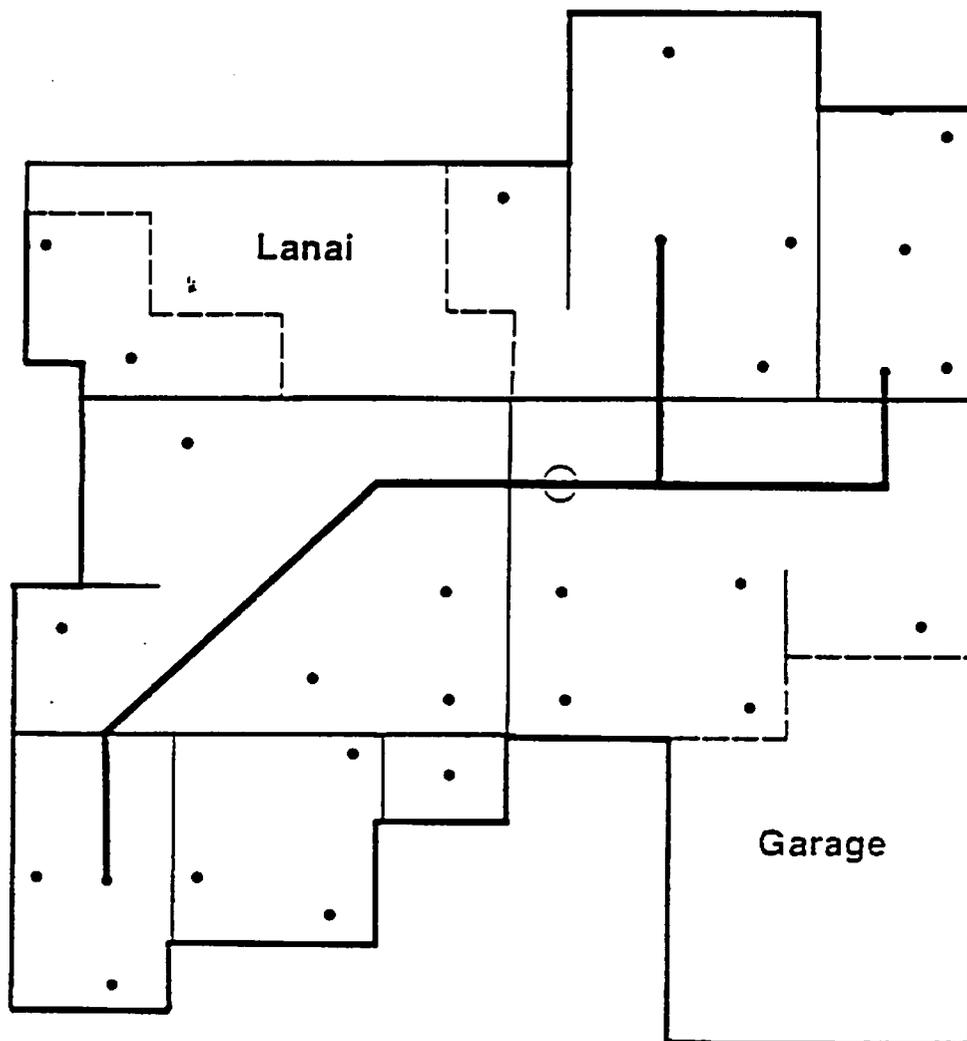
House #2 footprint, with mat layout, interior footer and measurement point location.
